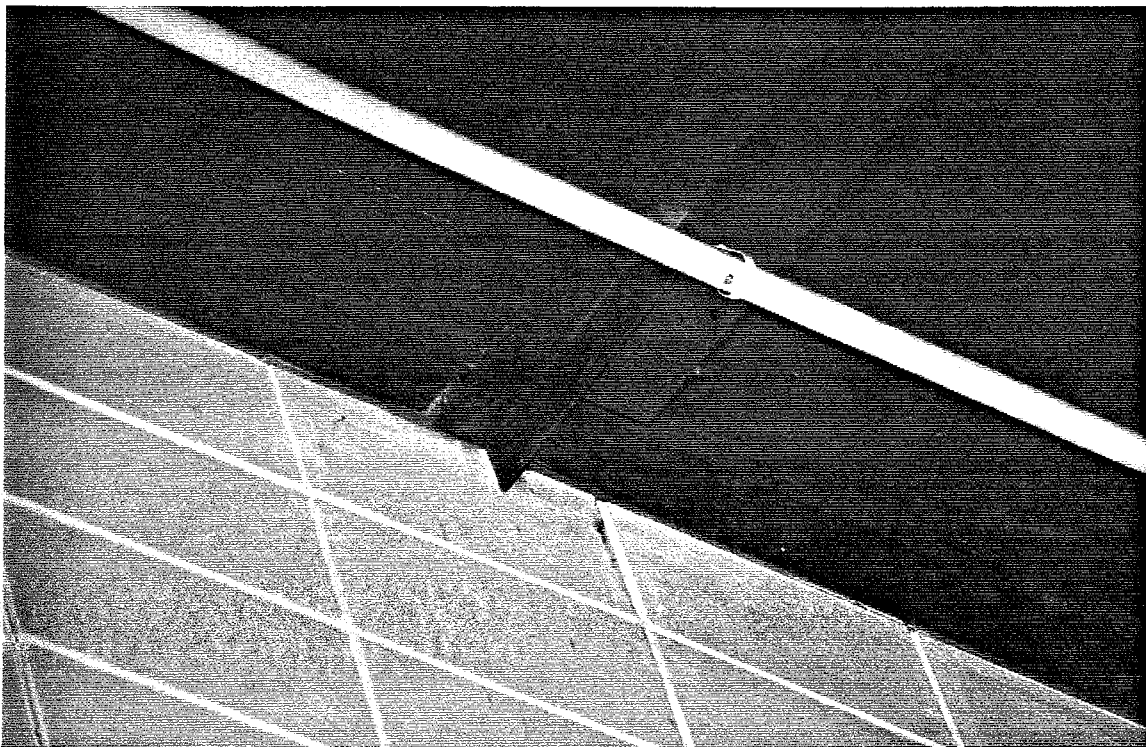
Temporary lateral support for wall provided by steel angle attached to bottom chord of roof trusses.
